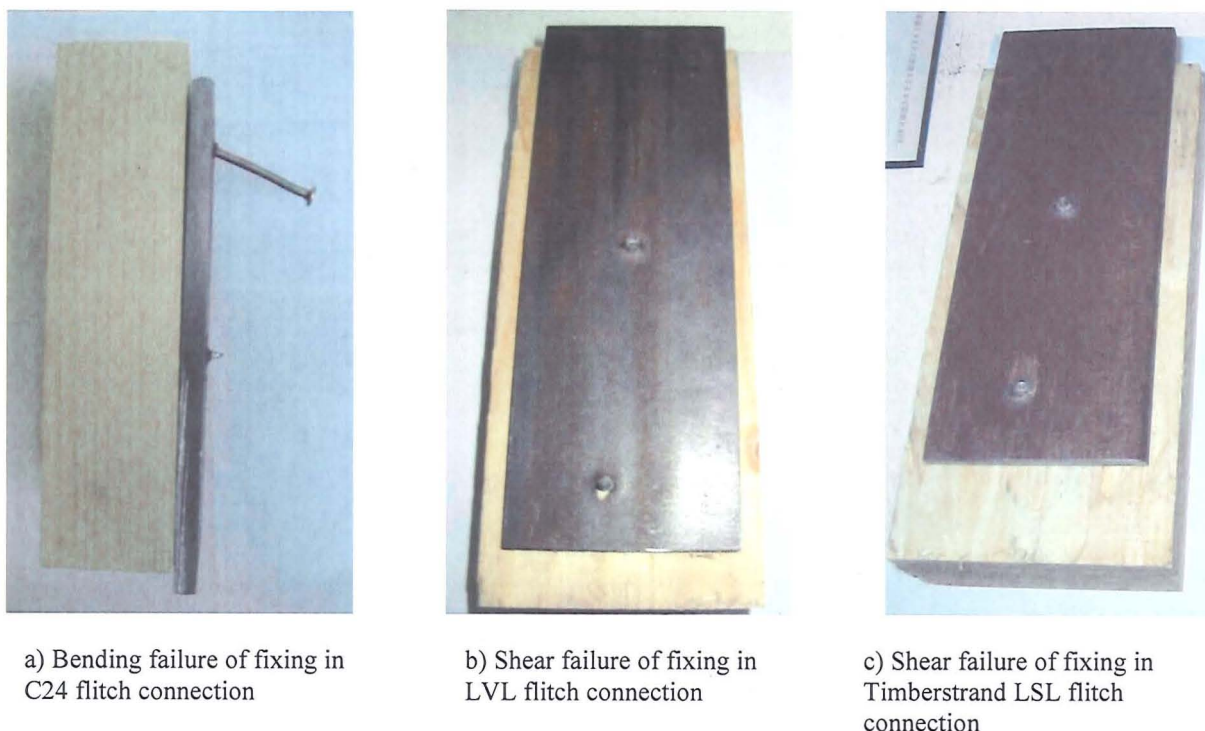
Examples of laterally loaded shot fired dowel connection failures
